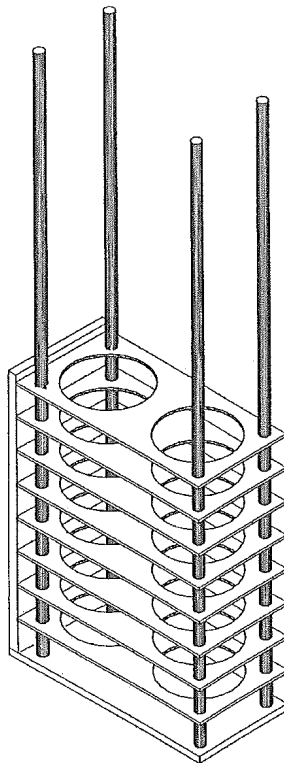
Proposed corner confinement reinforcement for Hybrid Wall system.
